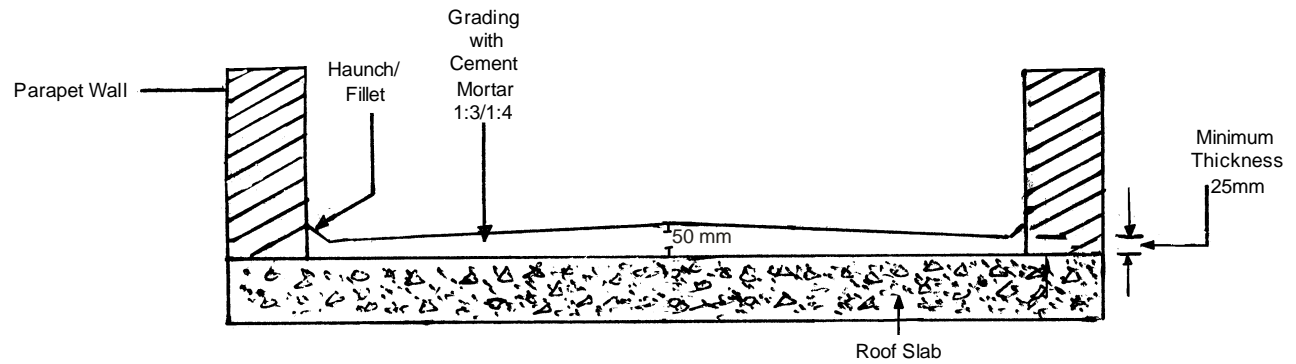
Grading Roof Slab with Cement Mortar 1:3/1:4
